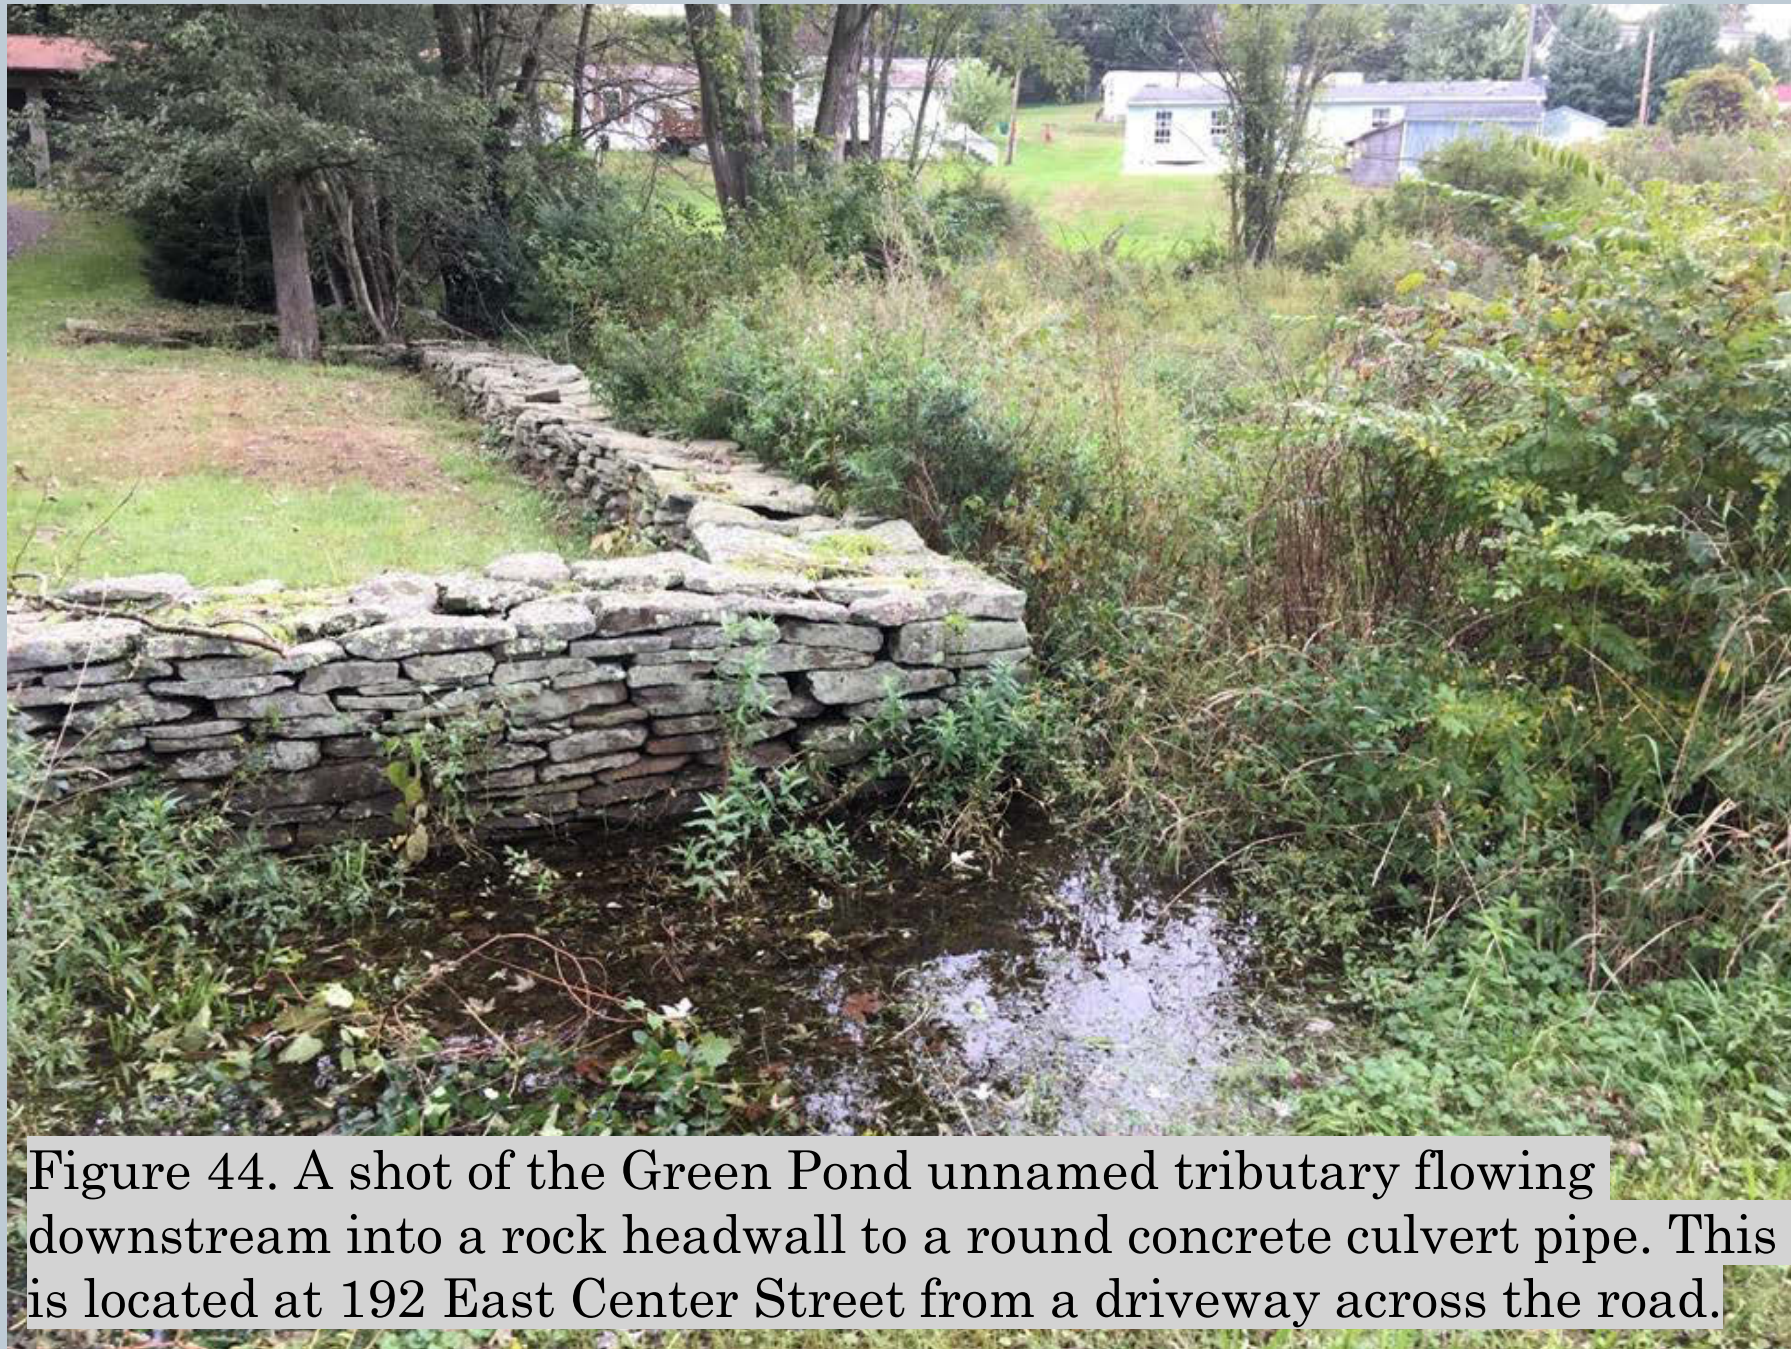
A shot of the Green Pond unnamed tributary flowing downstream into a rock headwall to a round concrete culvert pipe. This is located at 192 East Center Street from a driveway across the road.
